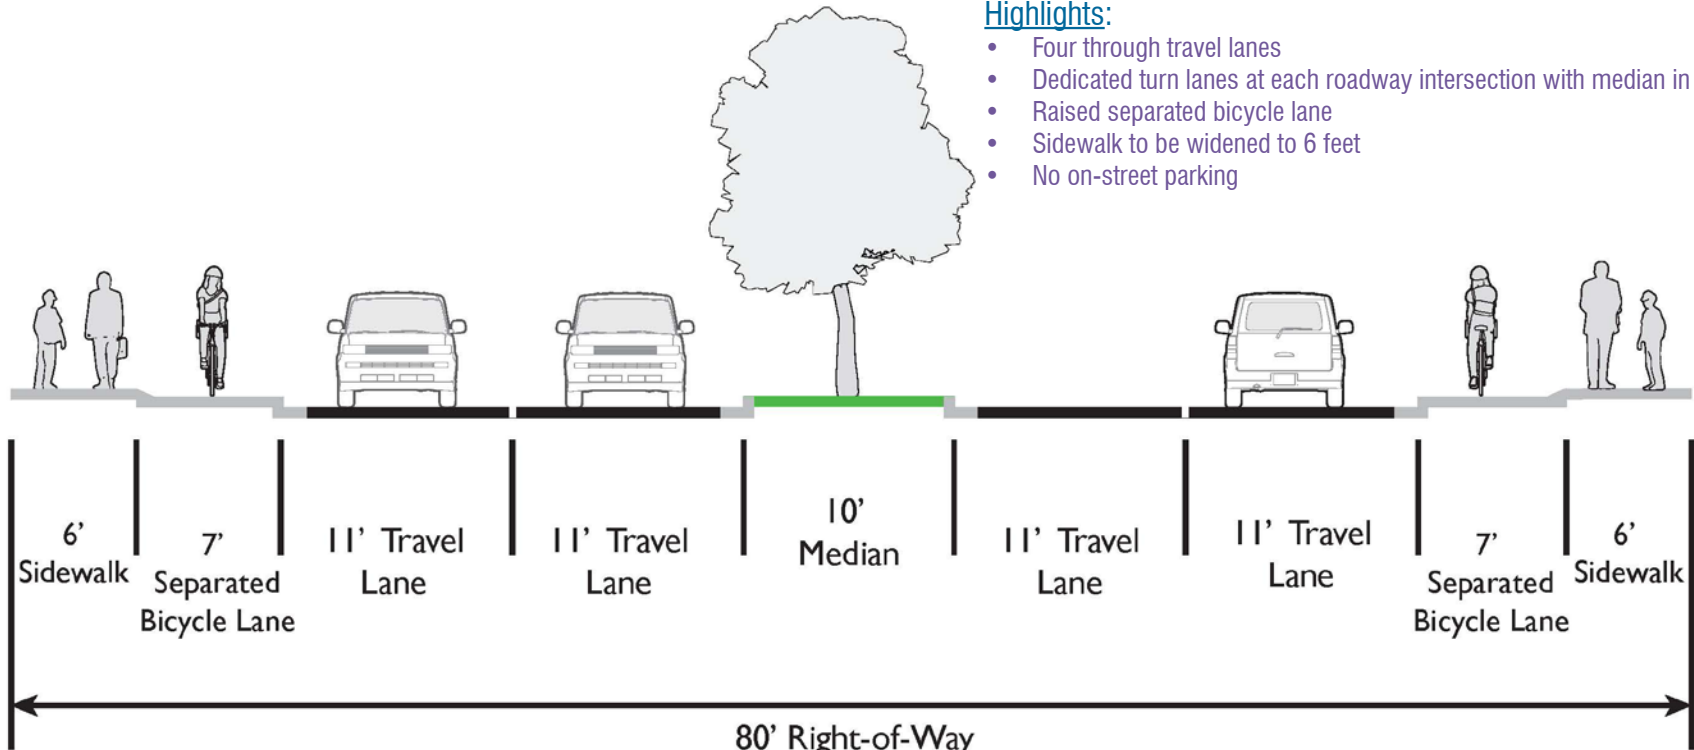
West Residential Zone Enhanced Existing with Separated Bikeway - Section
